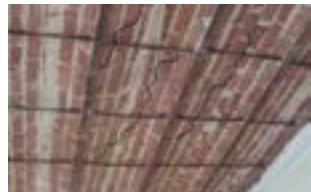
Cracks in brick masonry vaults - (photo author)
